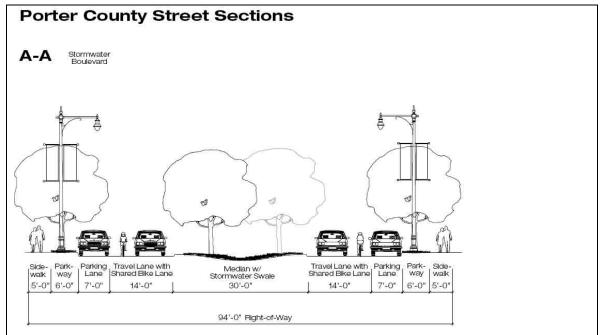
Porter County TND Street Section Classification "A-A": Stormwater Boulevard featuring a median with stormwater swale, travel lane with shared bike lane, parking on both sides of the street, parkway and sidewalk.
